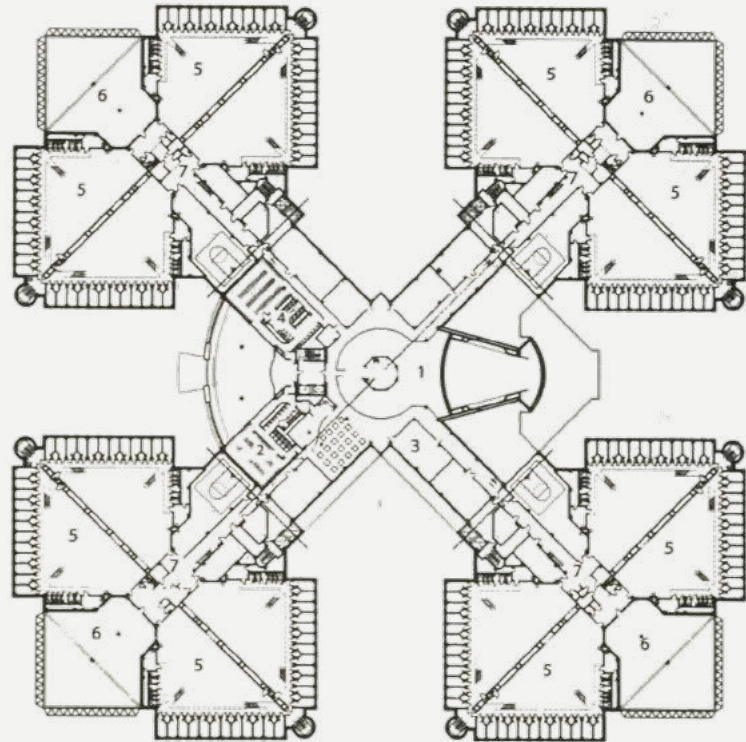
Cook County Floor Plan (from *Plans: Prison Facilities*)
